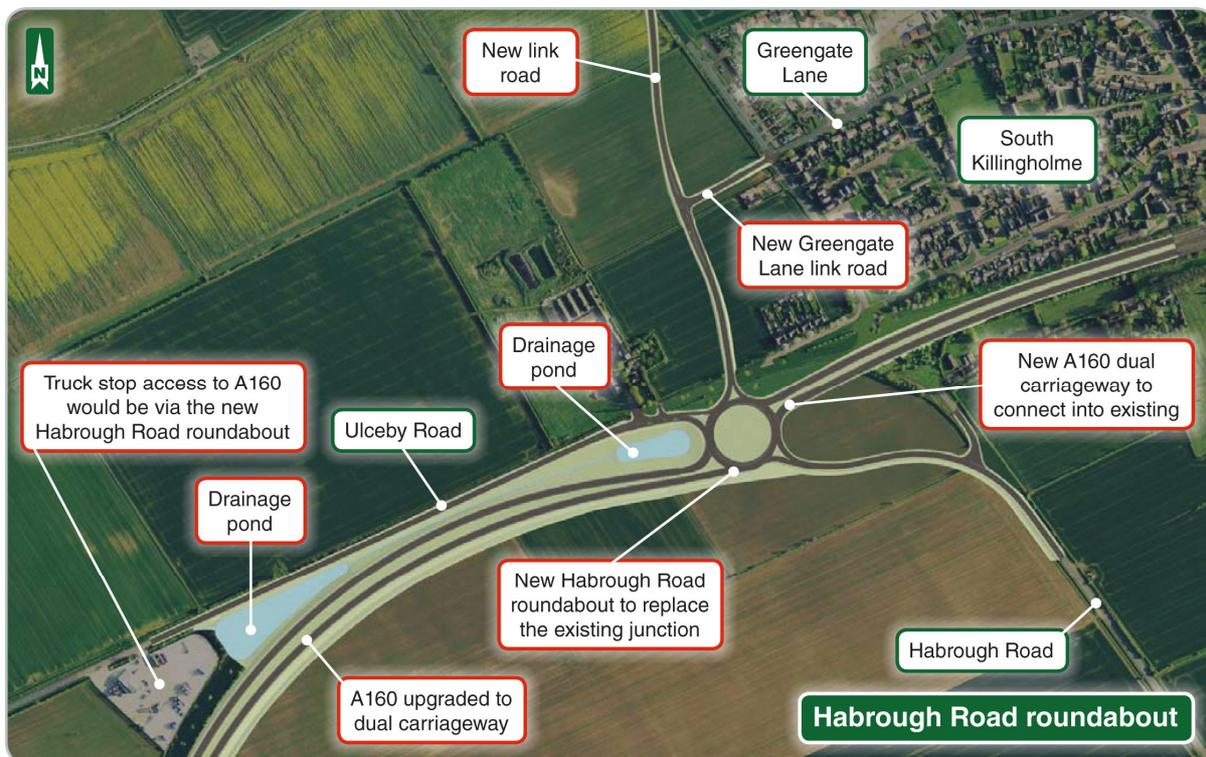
Area 2 (Habrough Road roundabout) Design Proposal
